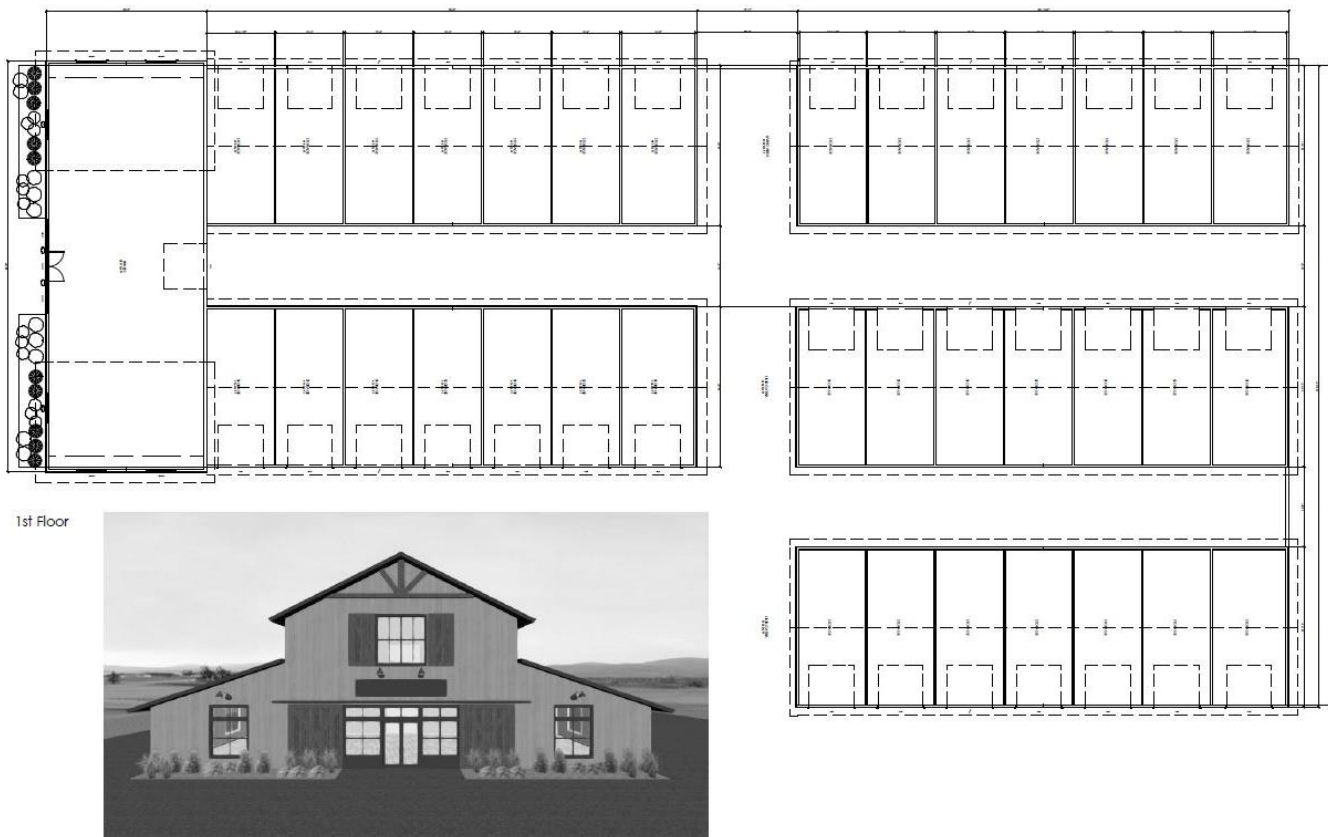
Floor Plans – 1st Floor Health Club + Storage Units (Source: Wren Design Studio)
